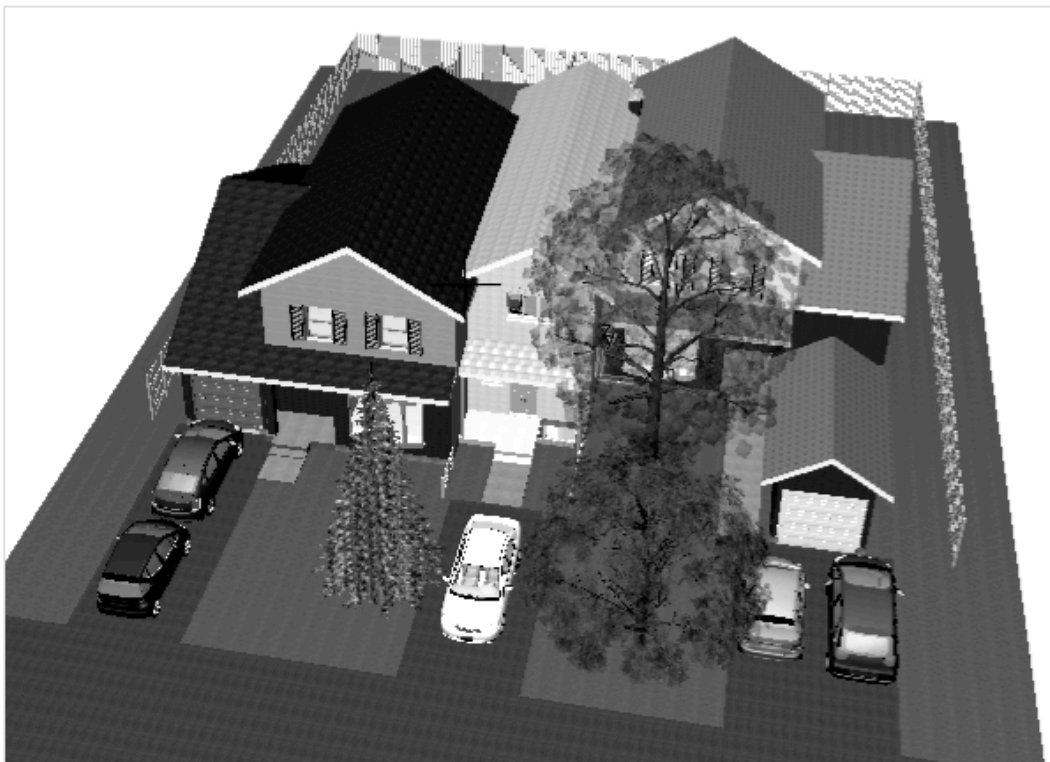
Four metre-wide infill house, street elevation source: drawn by author 2014
